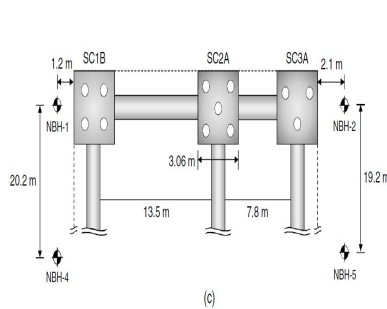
Schematic layout of piled rafts, Yanghoon Roh et al.,(2015)
